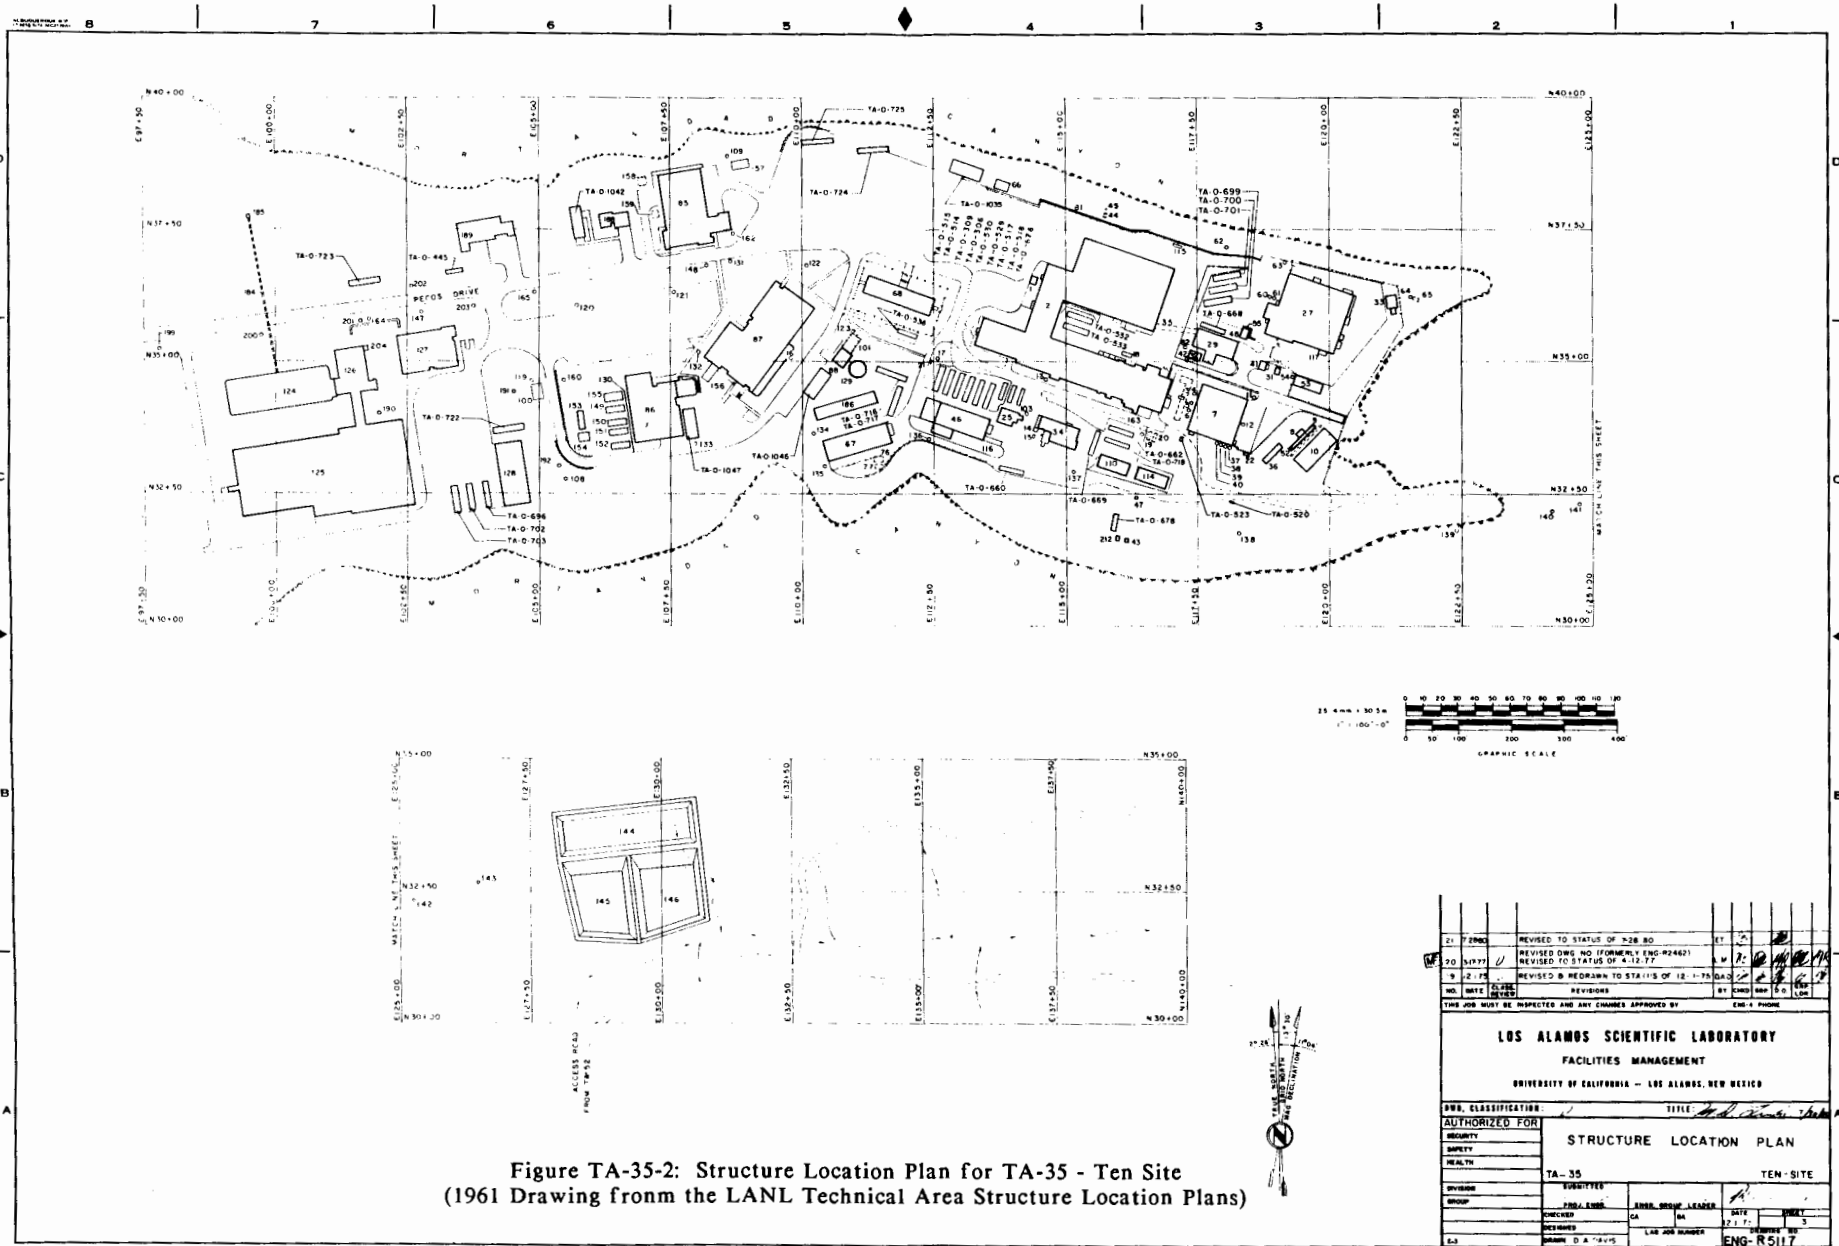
Structure Location Plan for TA-35 - Ten Site (1961 Drawing from the LANL Technical Area Structure Location Plans)
